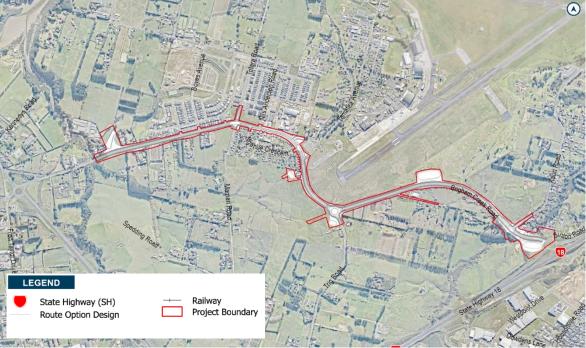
NOR W3 Brigham Creek Road upgrade overview
